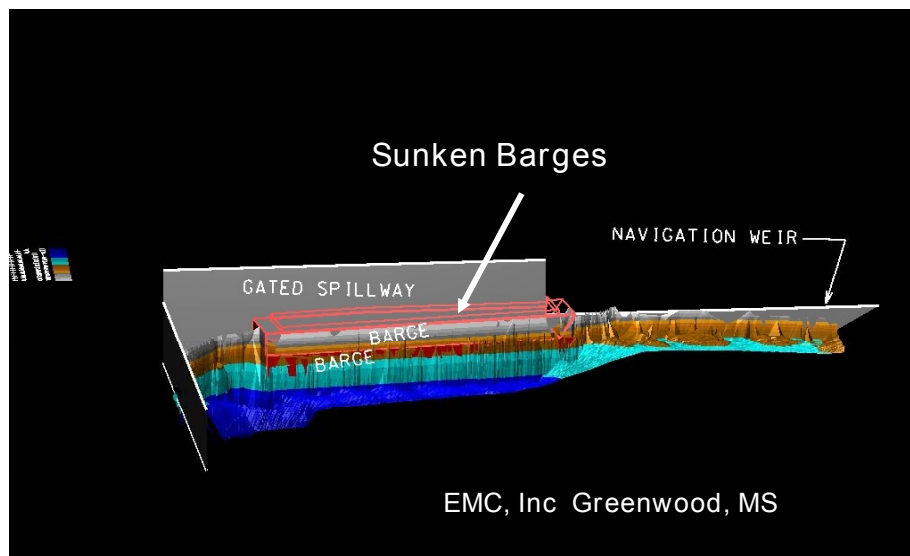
Columbia Lock & Dam (Vicksburg District)
